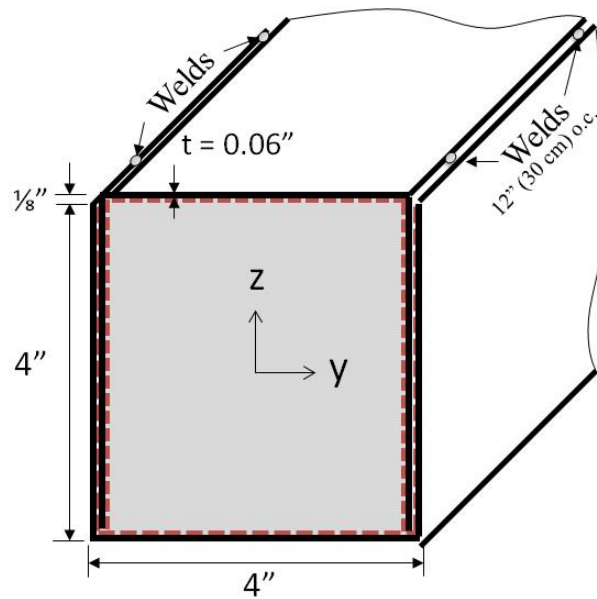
Illustration of “Adhesive and Welds” Column Cross-Section, as Oriented During Test to 20 kips and to Failure
